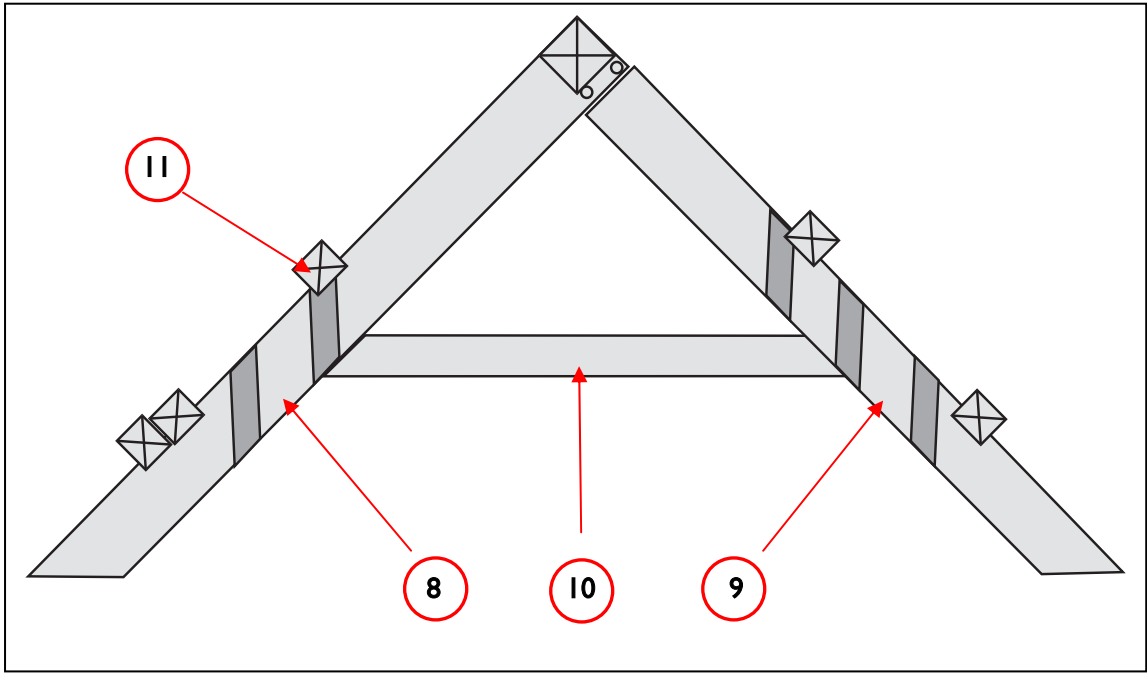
Schematic section of truss A-AI to show sampled timbers (viewed from the east looking west)
